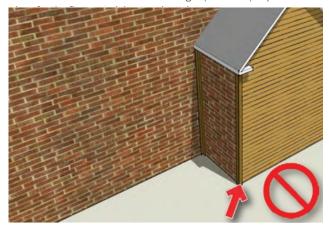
Material transition at outside corner. Changes in facade materials at an "outside edge" are discouraged as they give the facade a thin and cheap appearance.
